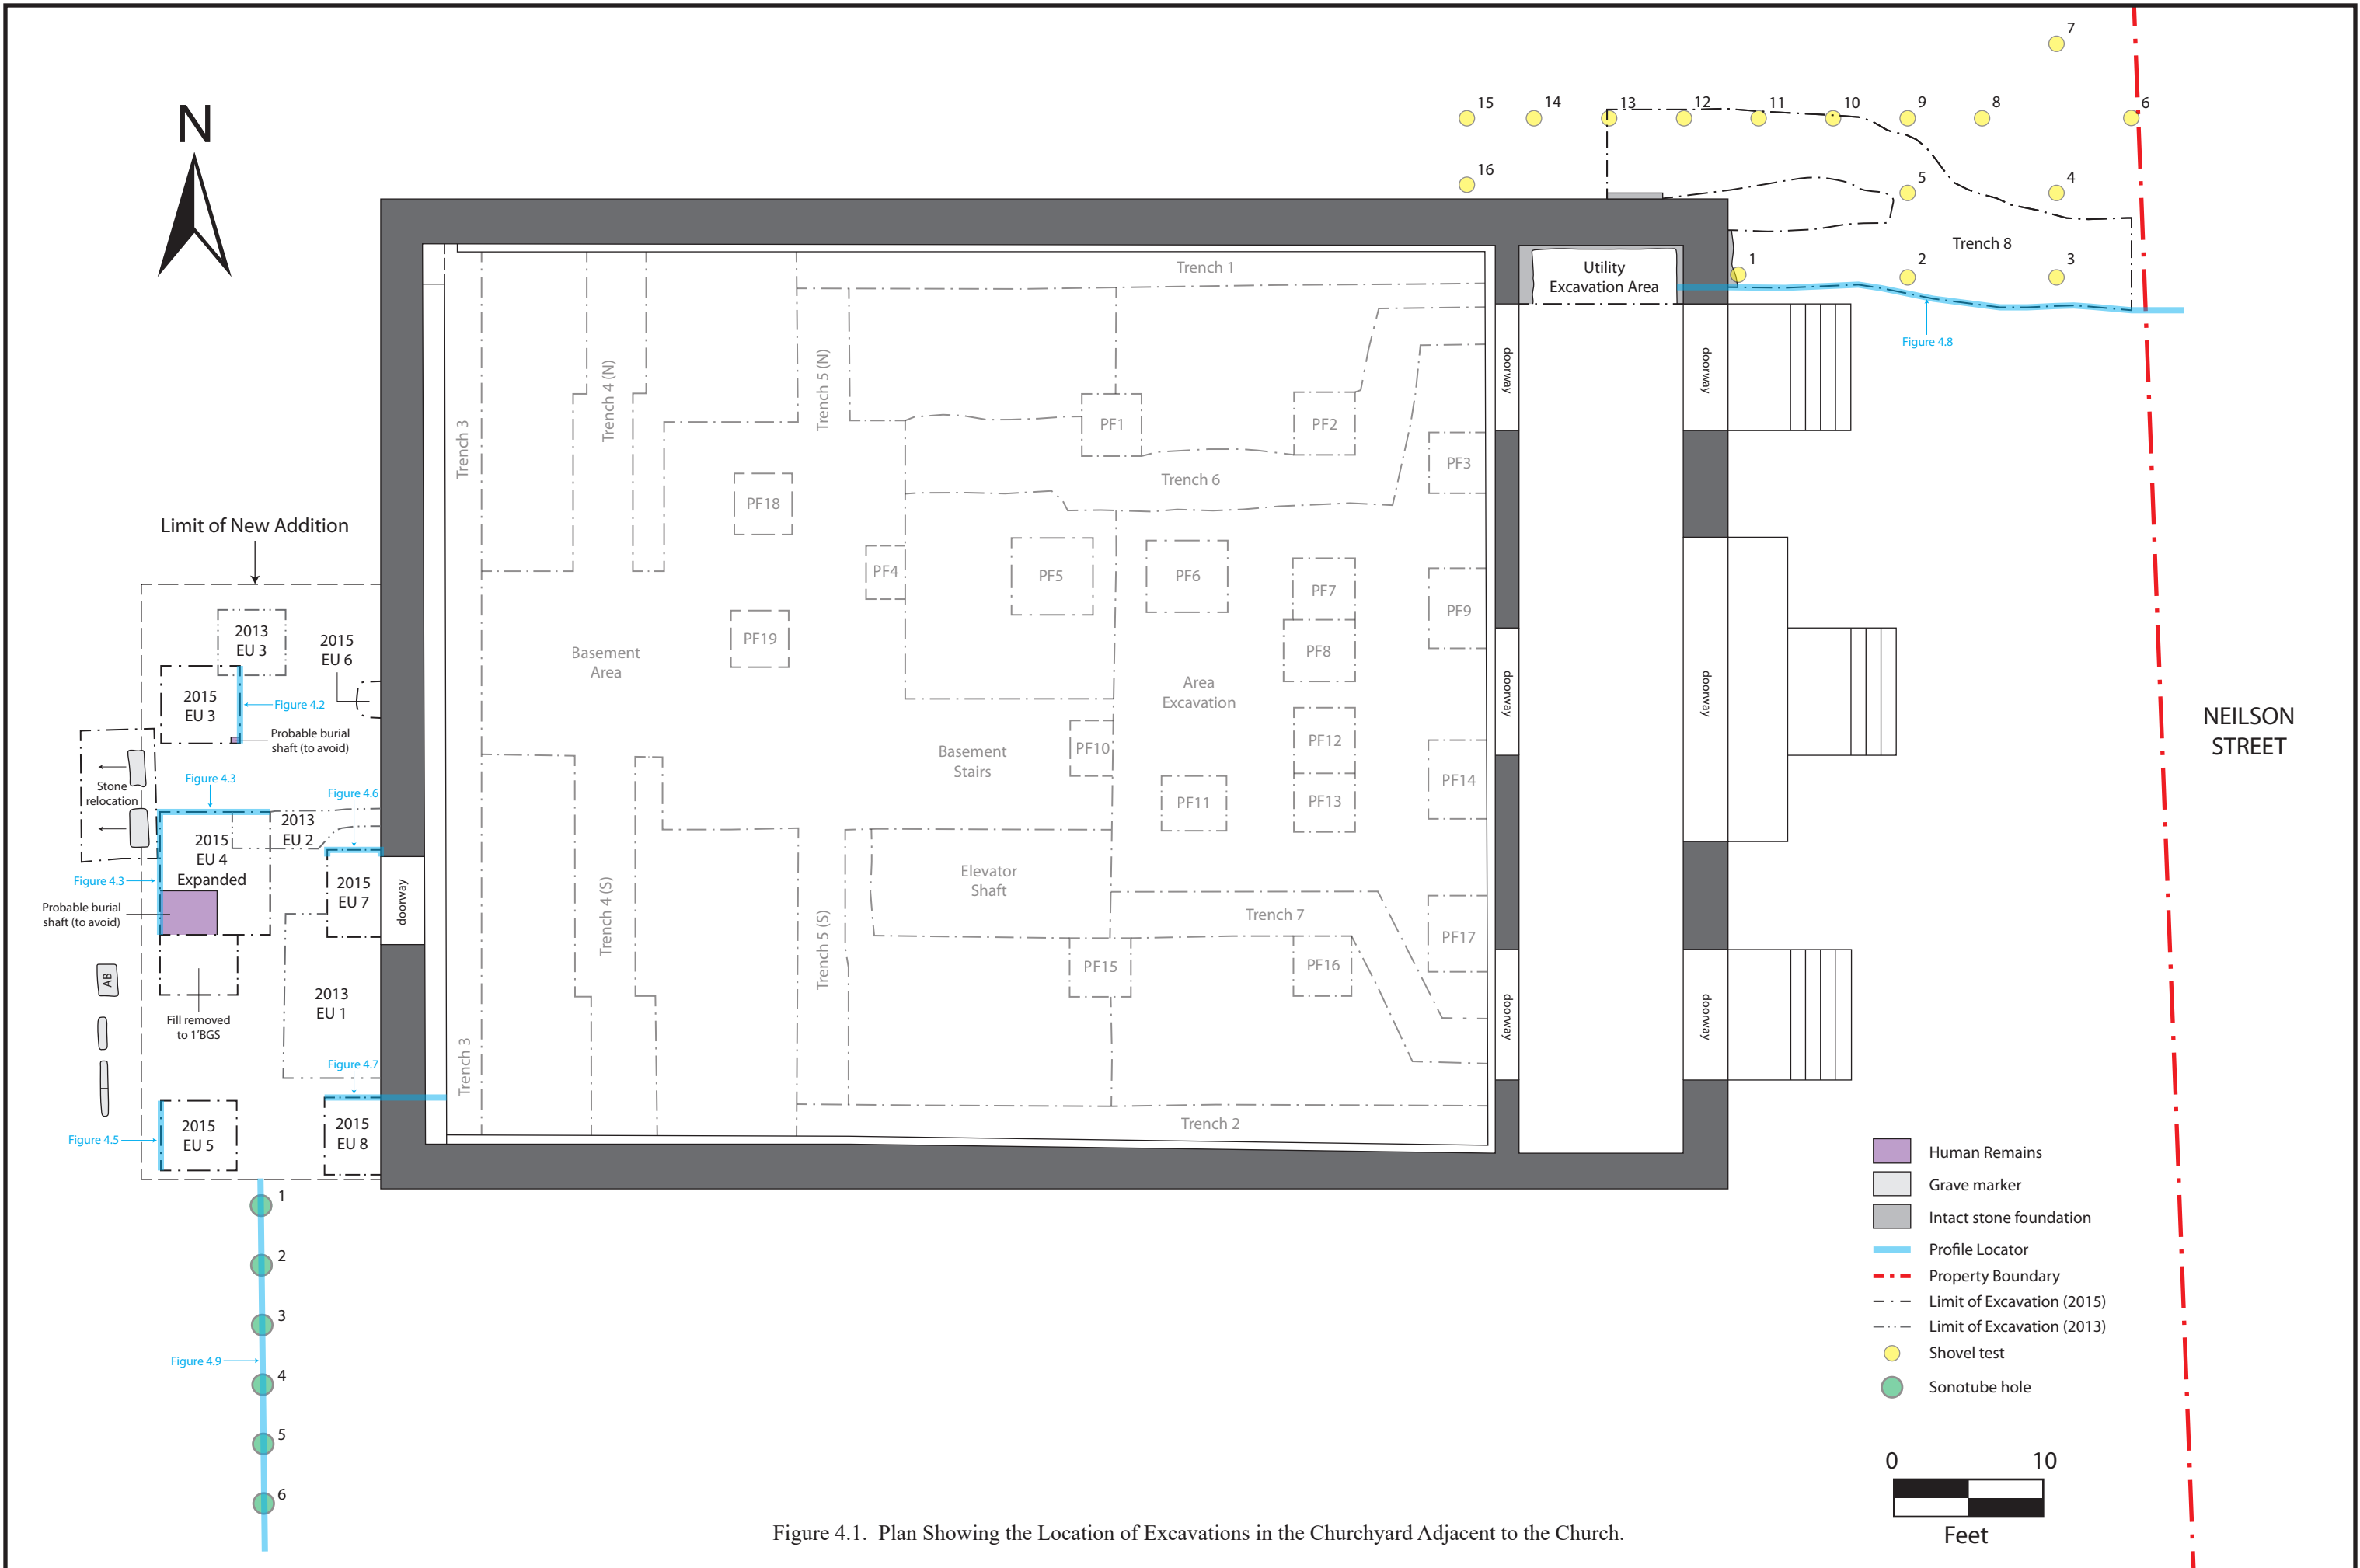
Plan Showing the Location of Excavations in the Churchyard Adjacent to the Church.
